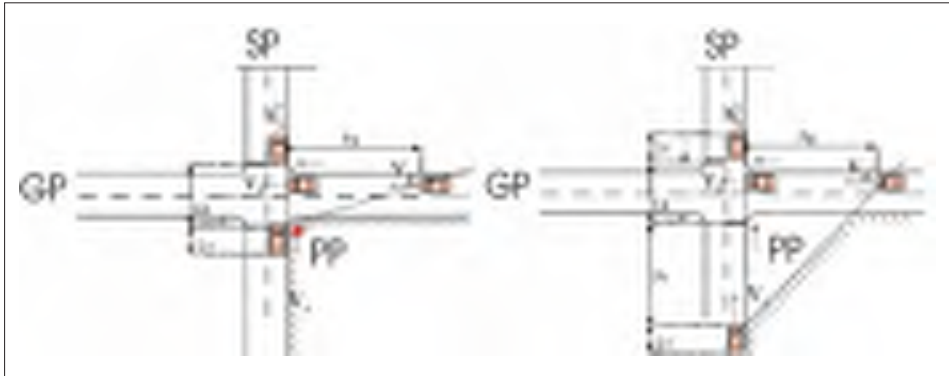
Sight distance for obligatory stop on minor road (left) and yield intersection (right); Croatian standard [4]
